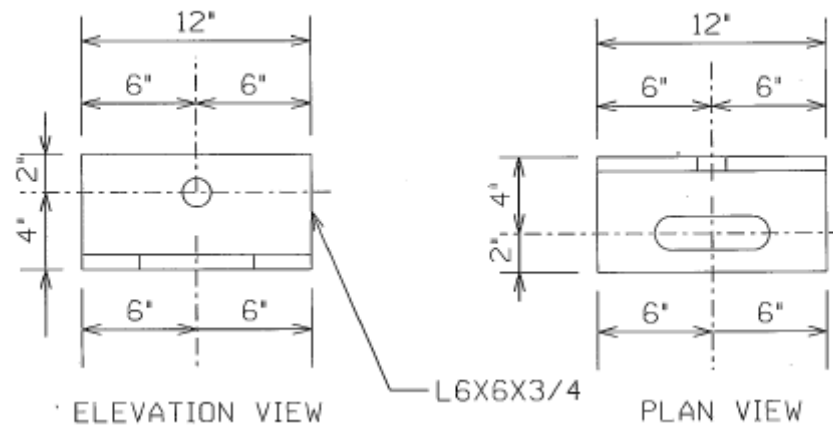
Oseligee Creek Bridge Abutment Connection (Expansion)
